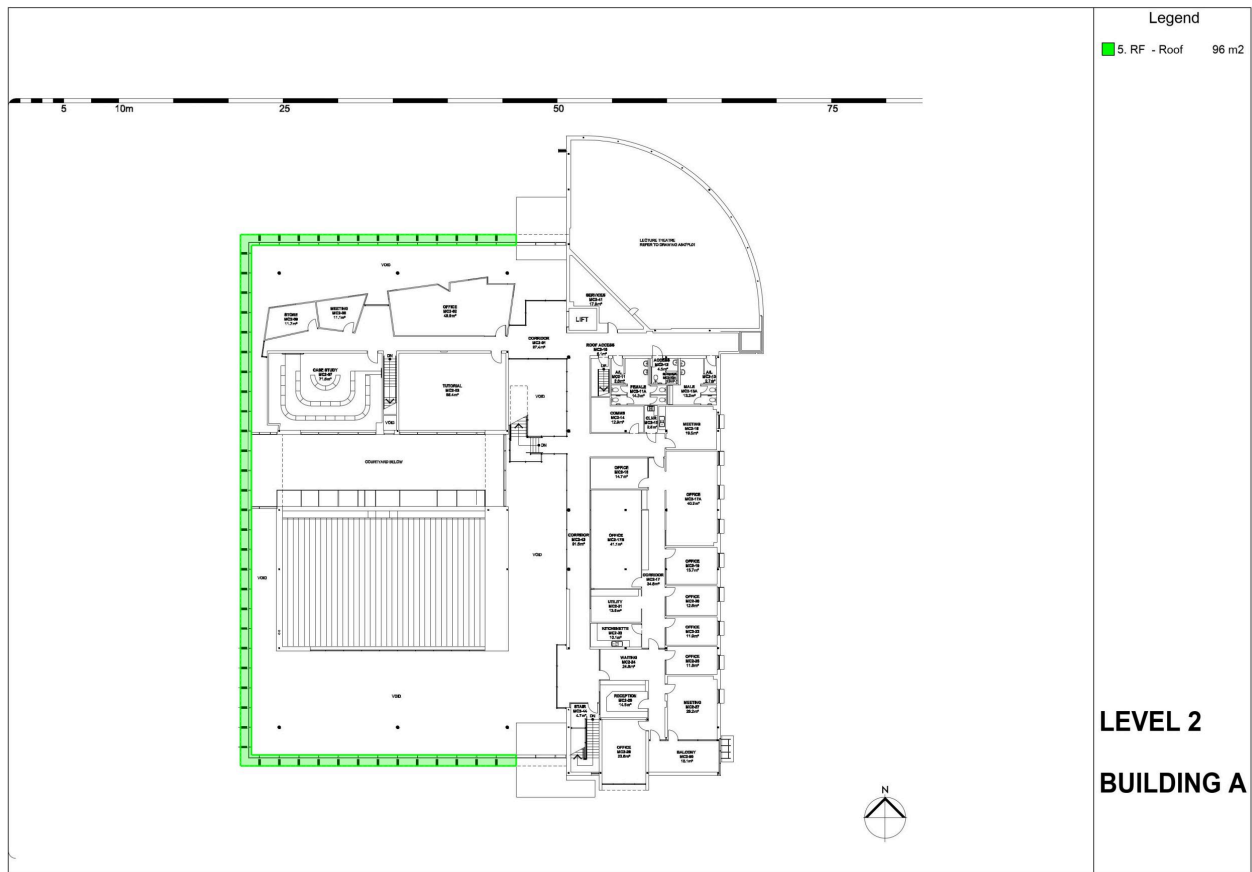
Building A – Roof (Level 2) measured as per ACMM (AQIS, 2022)
